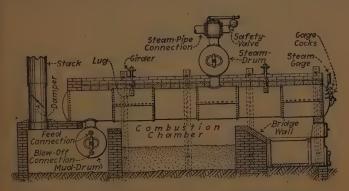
Sectional view of setting of plain cylinder boiler.
